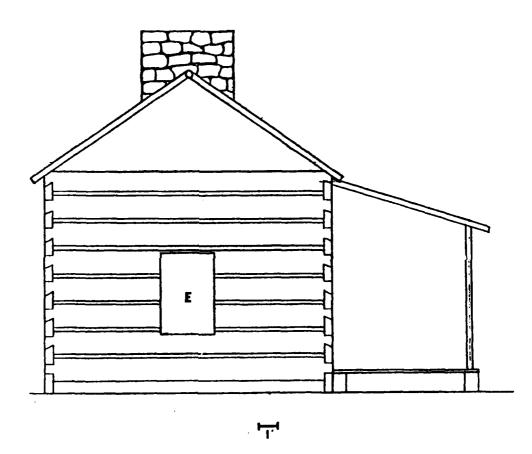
Hubert and Harley Fleming dwelling. Line drawing of right end of dwelling. Contrast porch roof construction as presented here with that in Figures 24 and 25.
